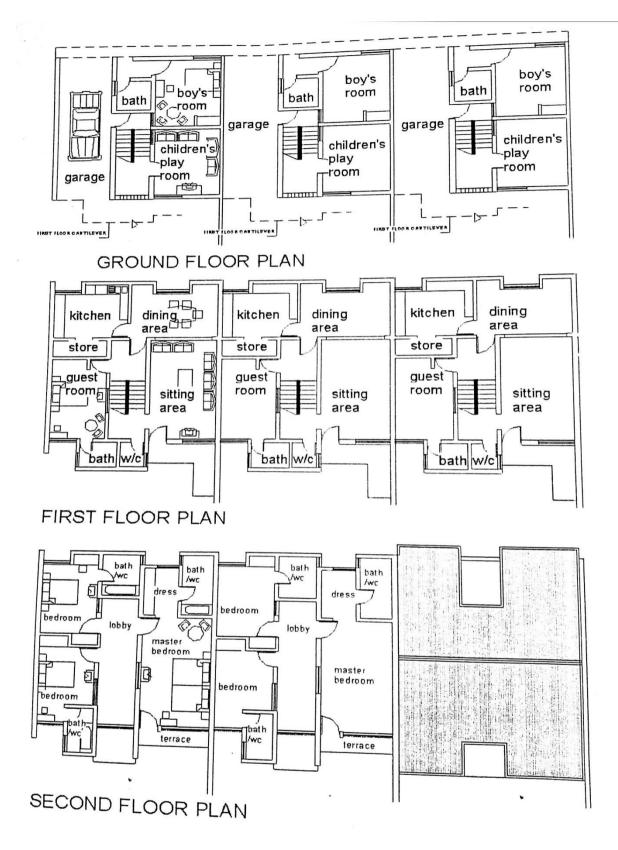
Showing Ground Floor, First and Second Floor Plans of a Typical Terrace Apartment
